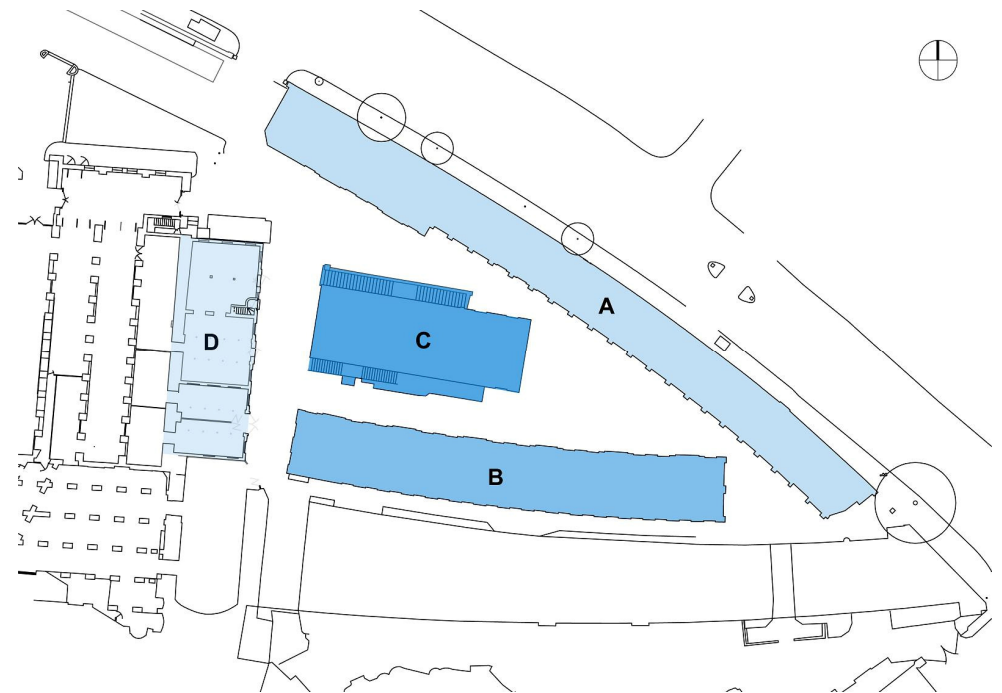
Stables Market - Listed group of buildings, subject site Building D
